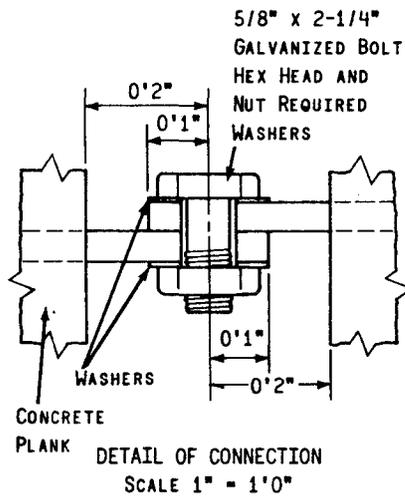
Assembly detail of precast concrete ramp planks (part 1).
